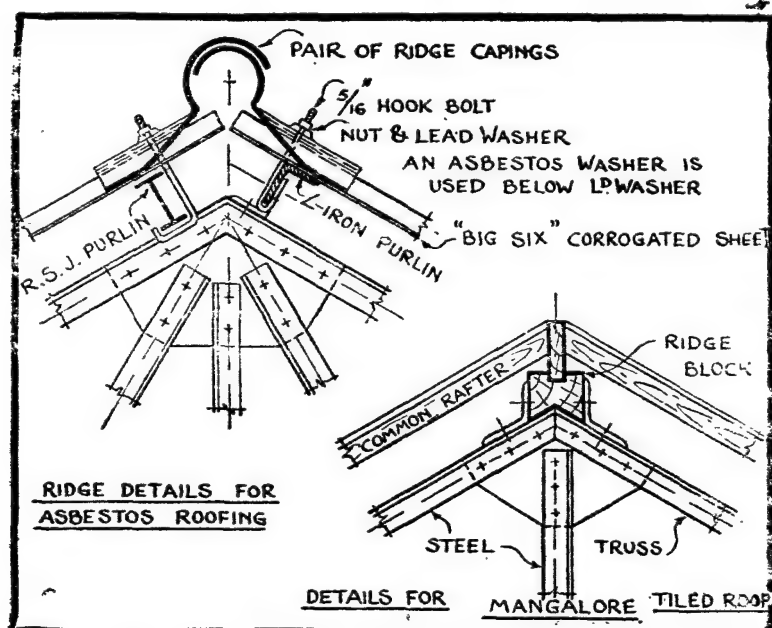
Ridge details showing the method of fixing the sheeting to steel purlins.
